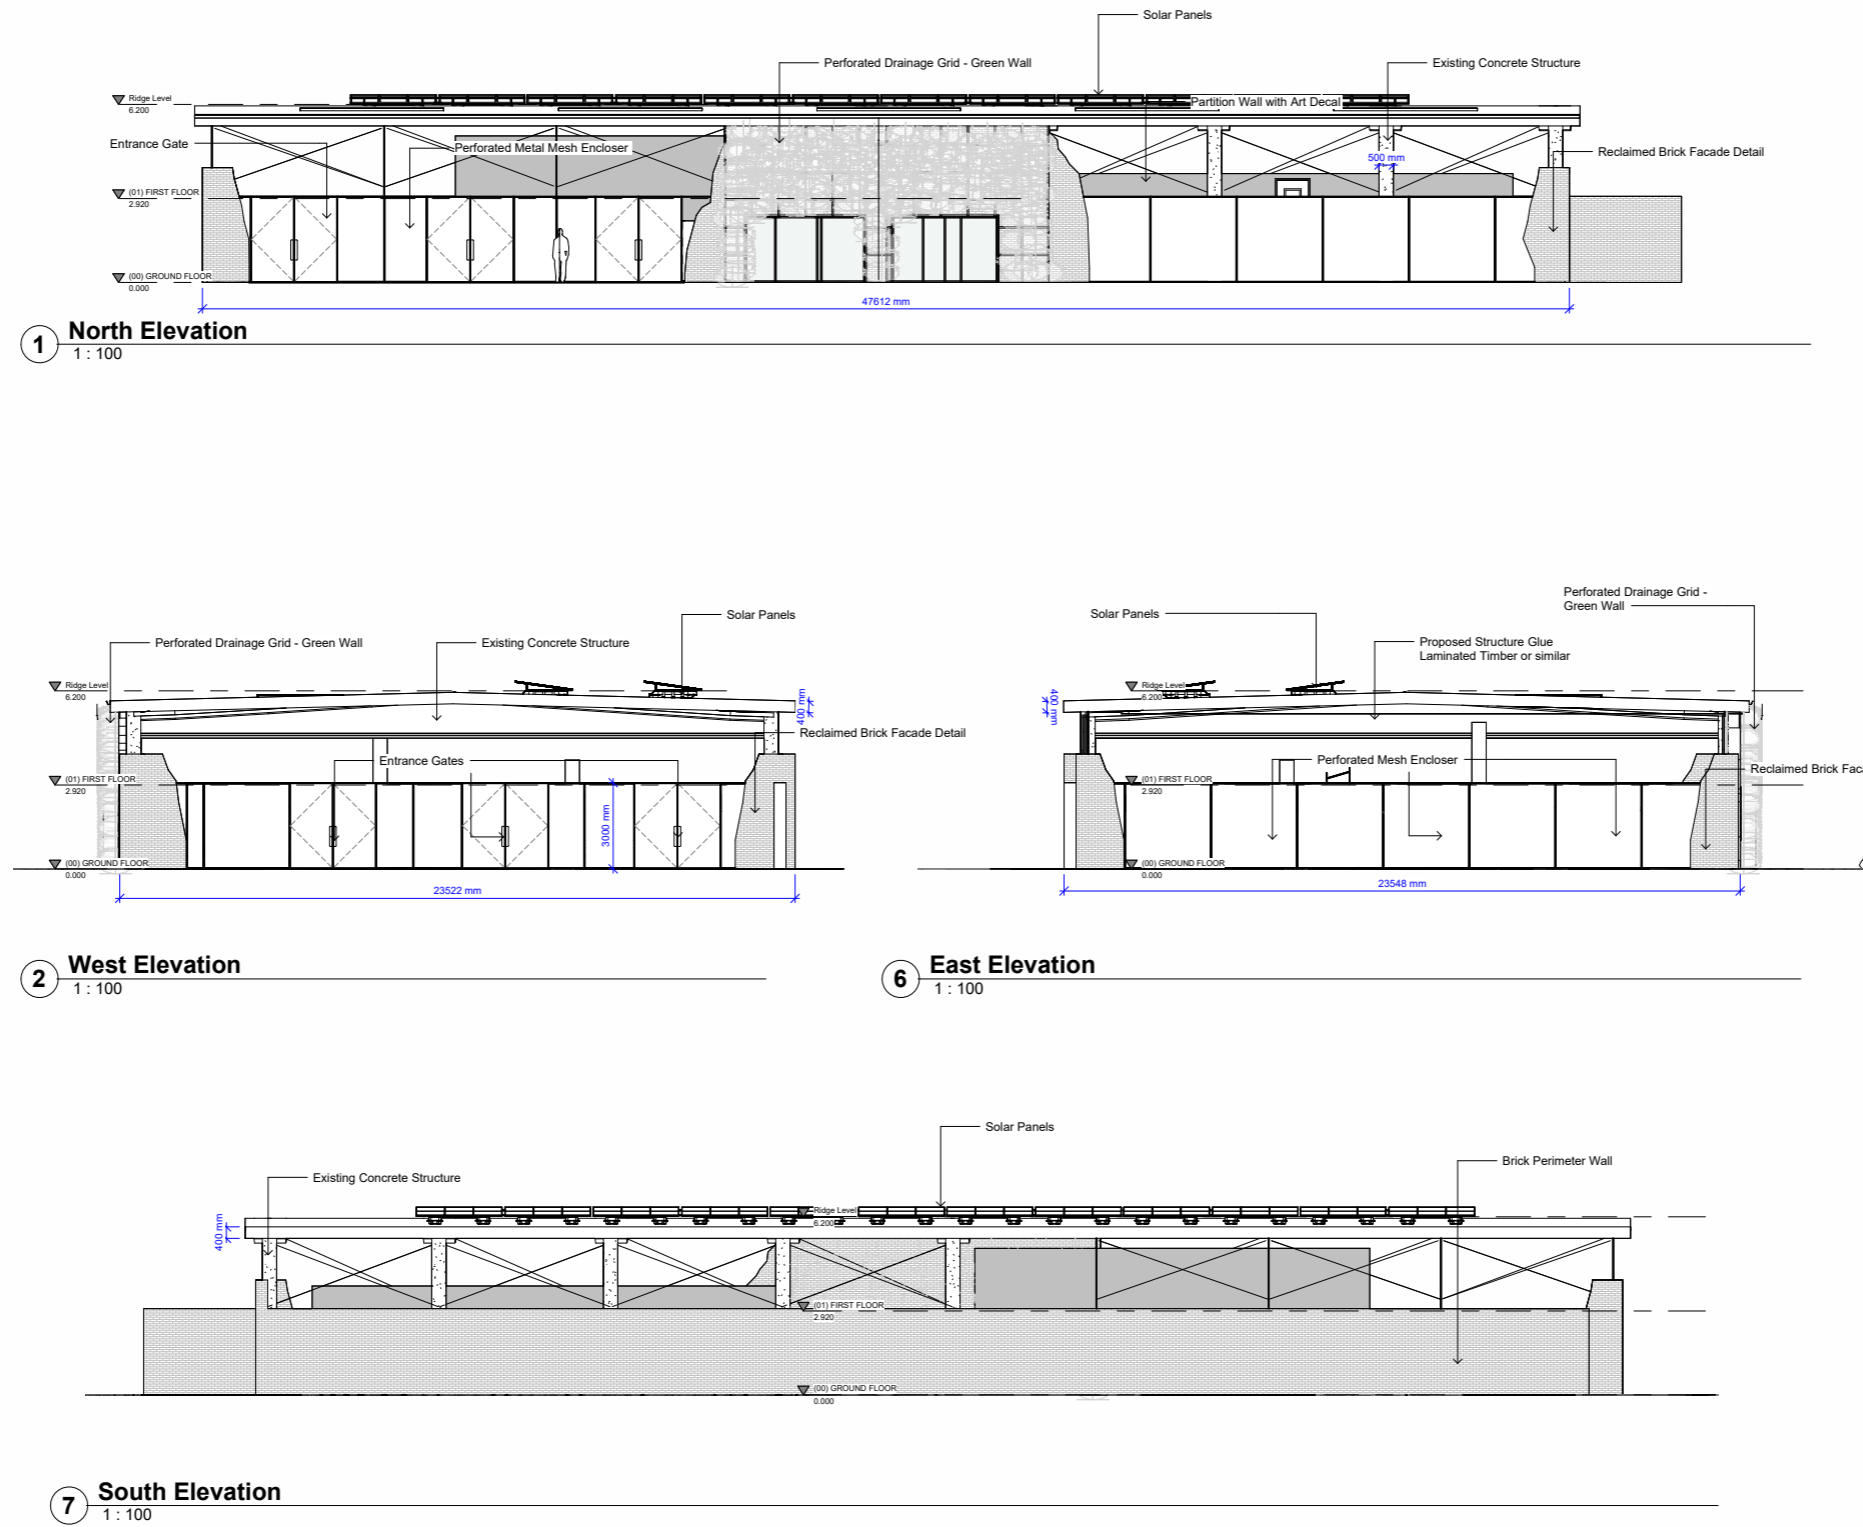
Sections and Elevations of the Proposed Building Retrofit
